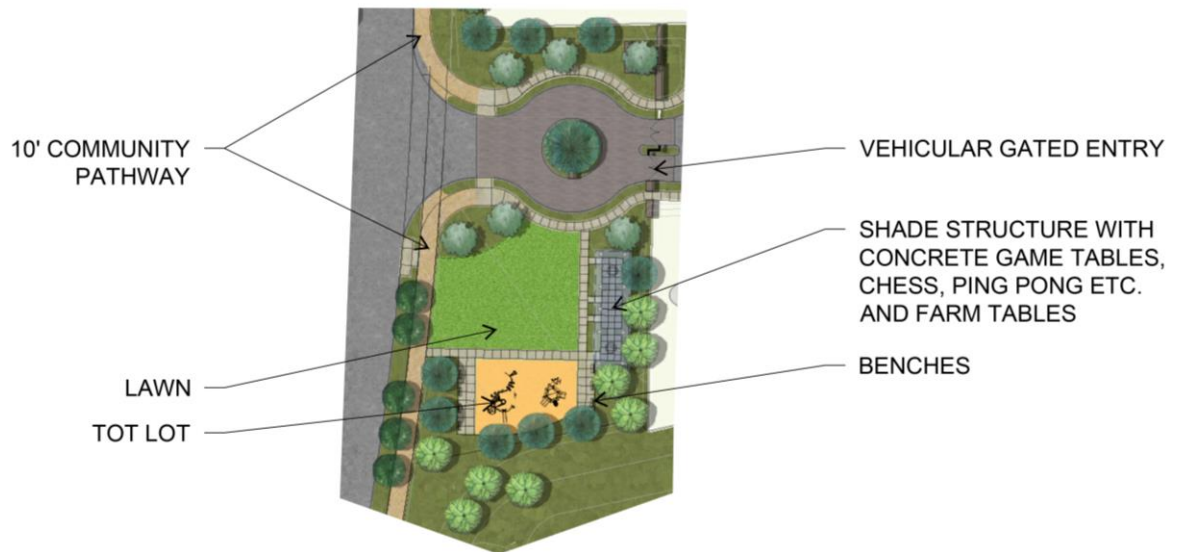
PP-5 Northwest Private Park Active Park Area
